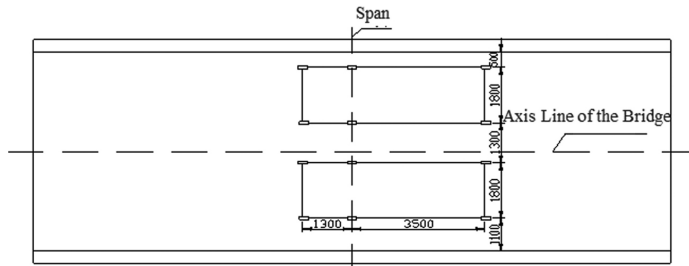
Diagram of offset load vehicle plan layout (unit: mm)
